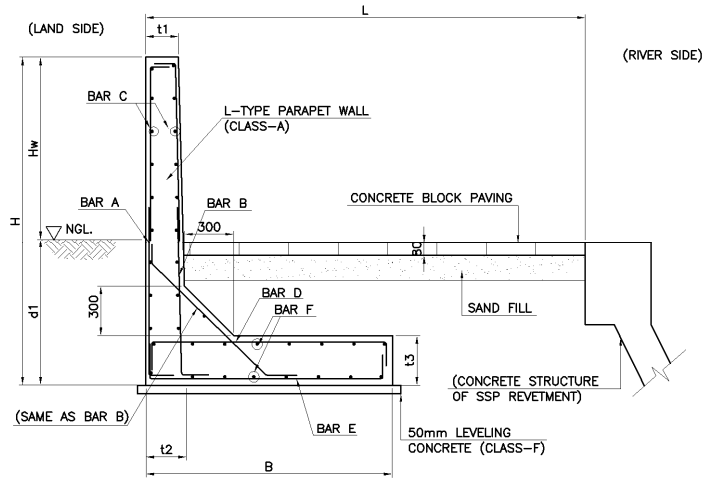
Typical Cross Section of L-type Parapet Wall
